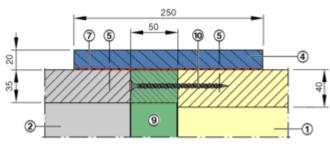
Installation detail B1: Connecting subframe on operating side (flush outside)
